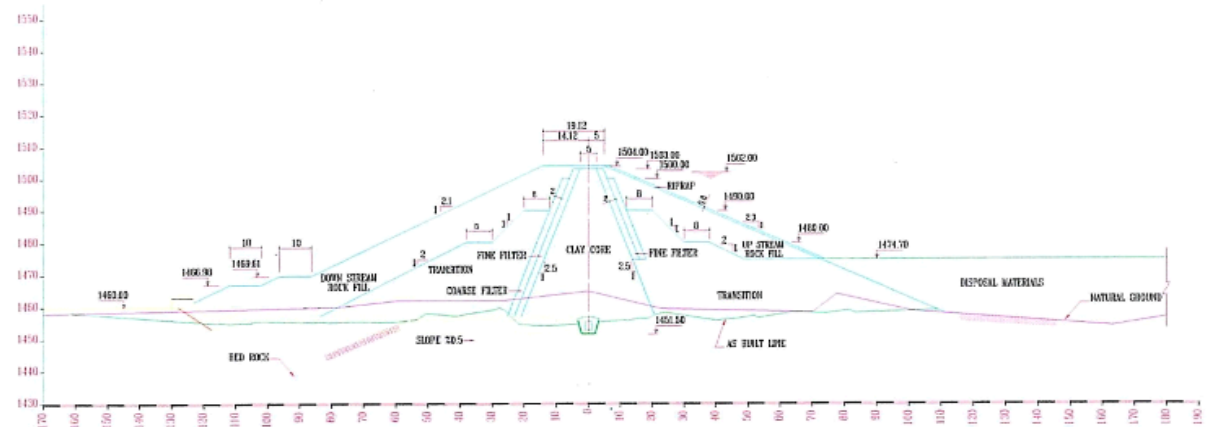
Cross-section of the dam and layers below foundation at the left abutment (section 21)
